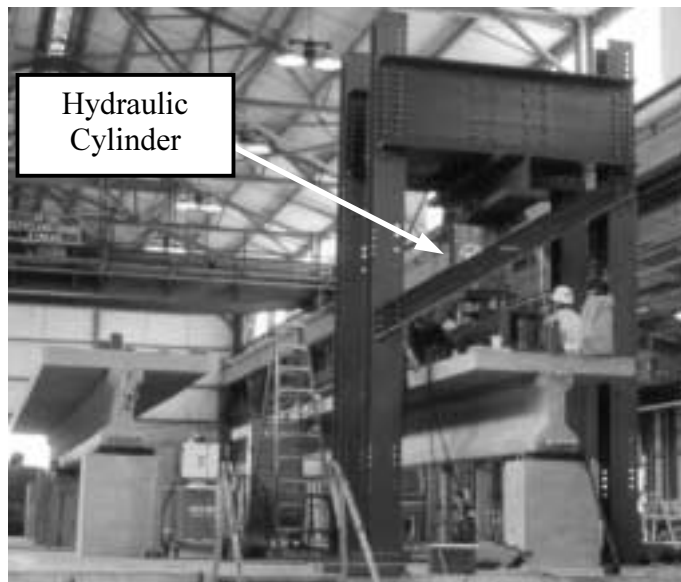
Loading Frame and Hydraulic Cylinder Used to Apply Test Loads
